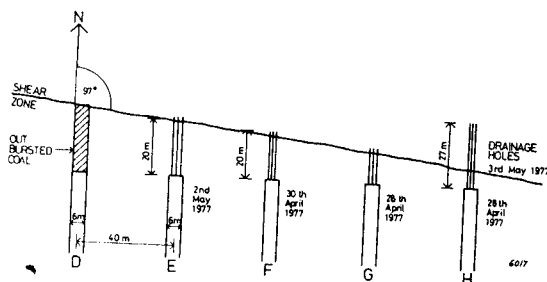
Drilling of 100 mm diam. relief holes in headings.
